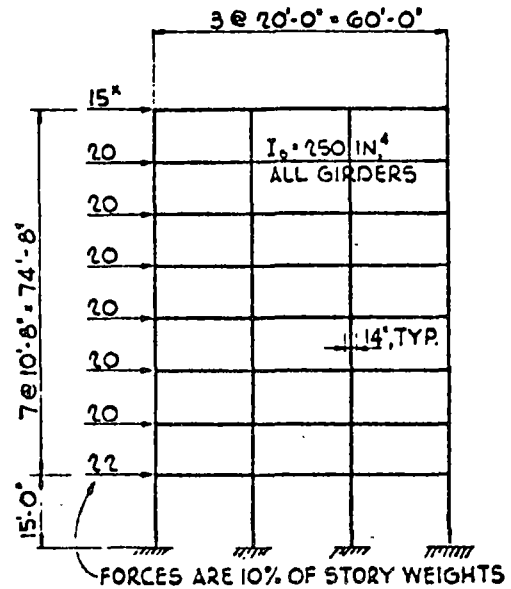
PARTIAL ELEVATIONS OF BUILDINGS
